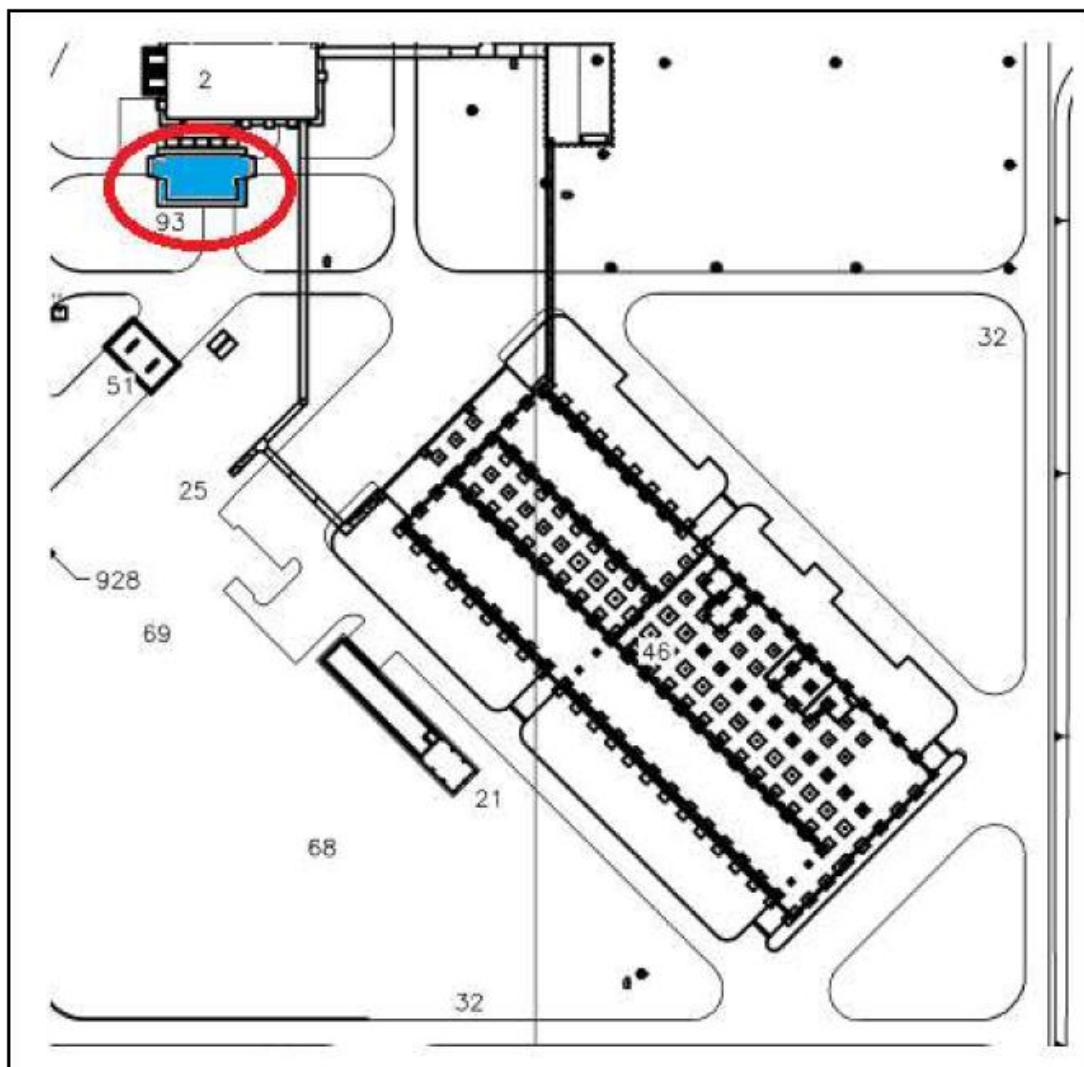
The Sandblast Workshop is located south of Substation East and northwest of Workshop and Stores building.
